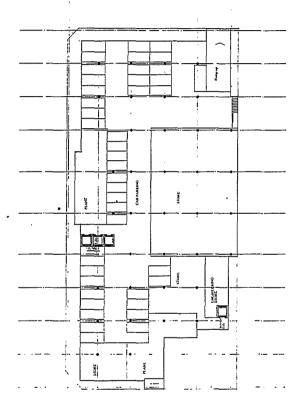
SITEPLAN RADIO AND ORCHESTRA PROJECT
